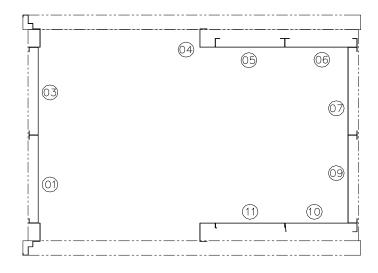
B. CAR PANEL AND ENTRANCE COLUMN ASSEMBLY
